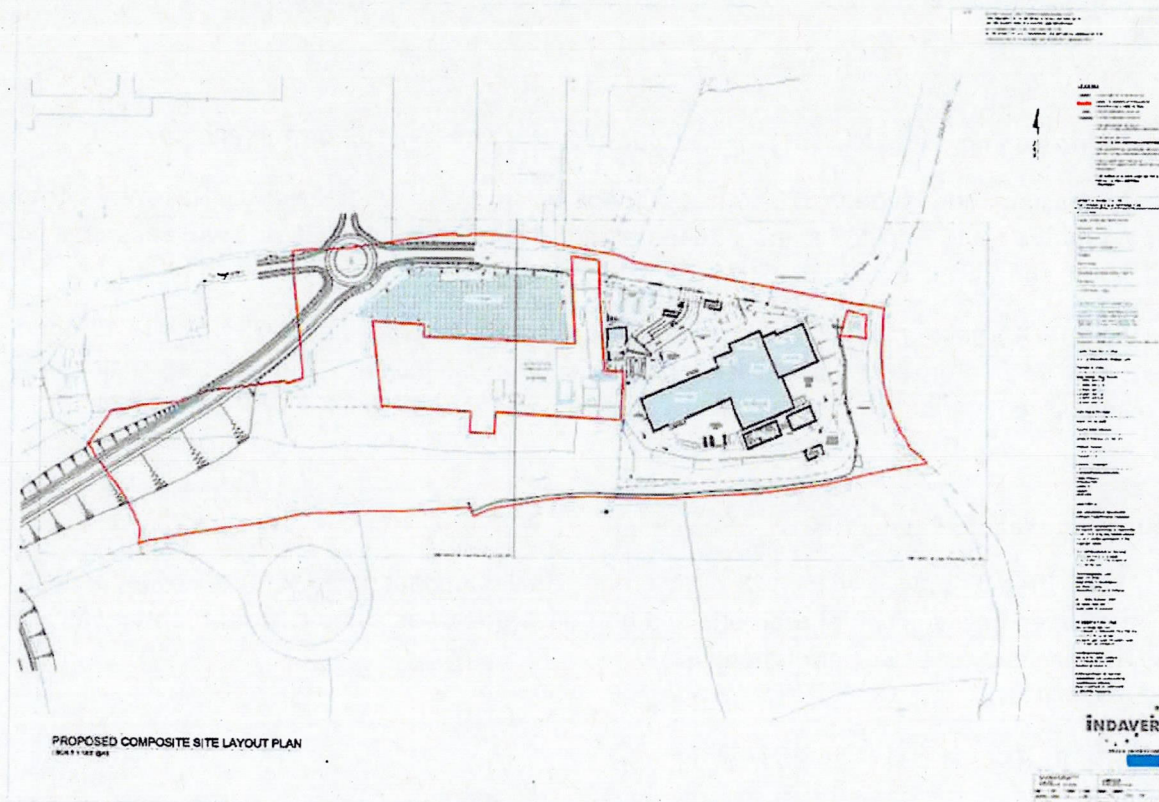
Proposed Composite Site Plan with Ringaskiddy Relief Road within planning boundary.
